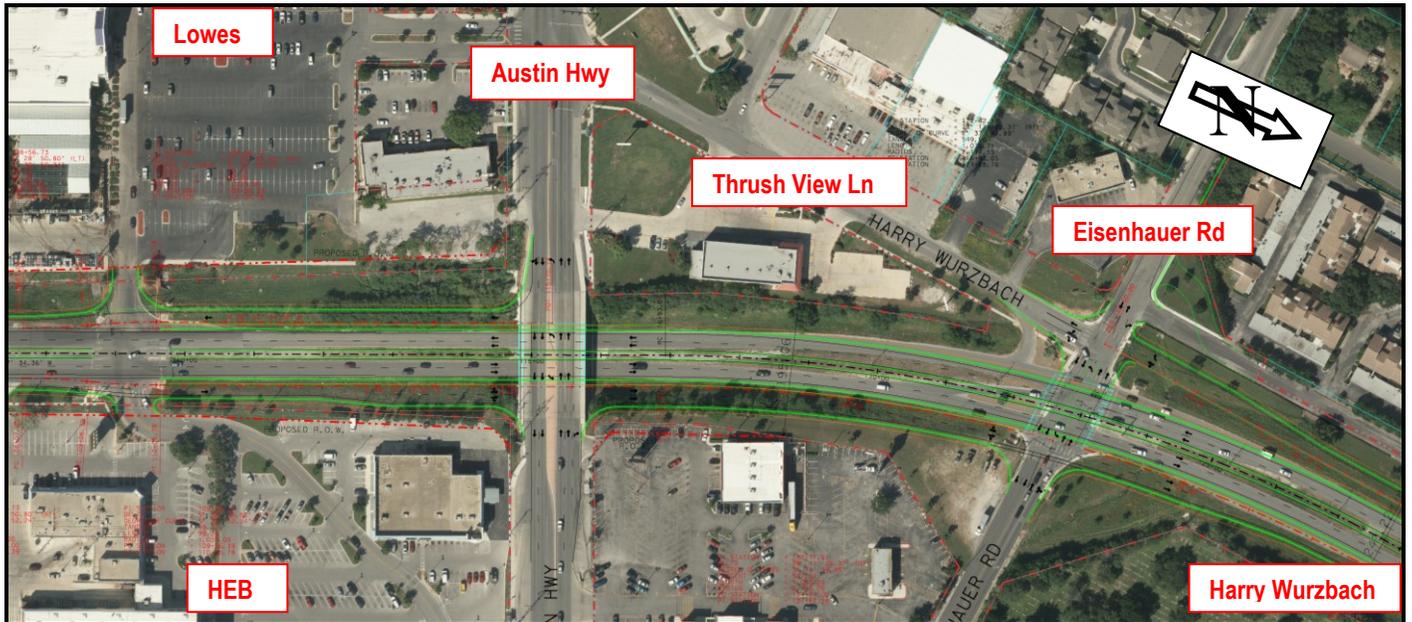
Proposed Roadway Improvements for Harry Wurzbach segment-Lowes/HEB driveway to Eisenhower Rd
